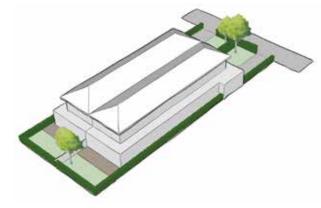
Typical dual occupancy constructed without the new 35% minimum garden area requirement
